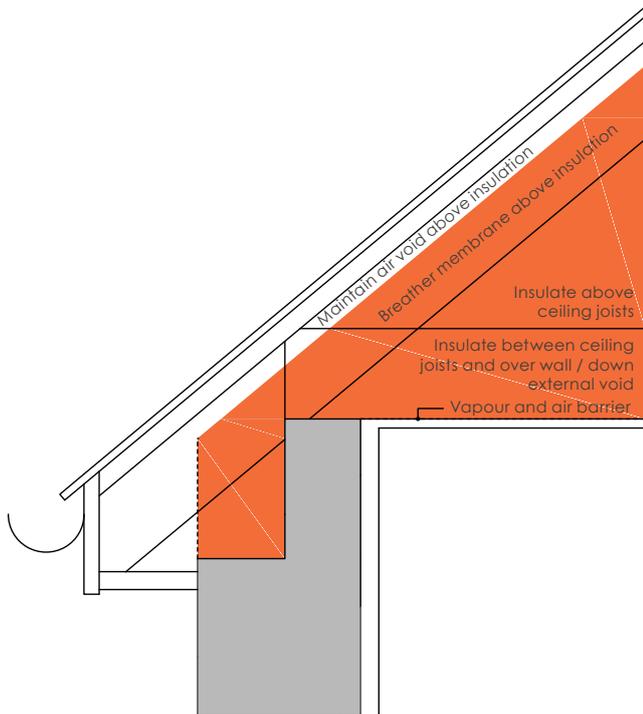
Insulation strategy for cold roof insulated between and above ceiling joists
